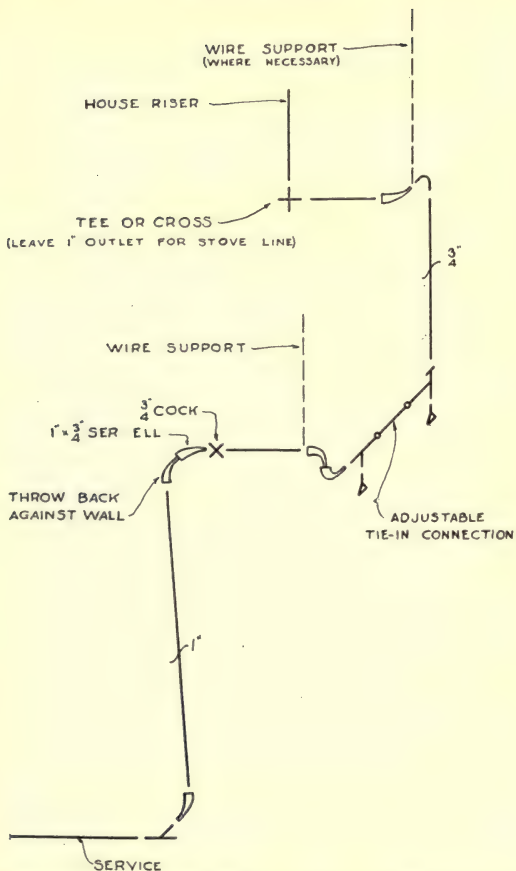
Adjustable Tie-in Connections with Adjacent Piping, page 465.
